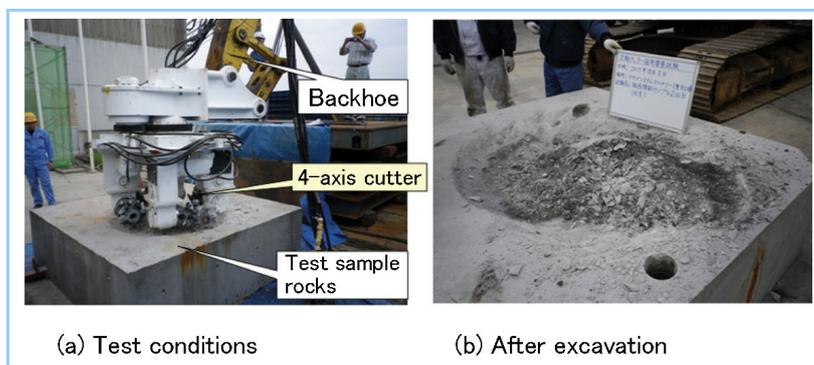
Element test for the excavating device fitted with a 4-axis cutter
